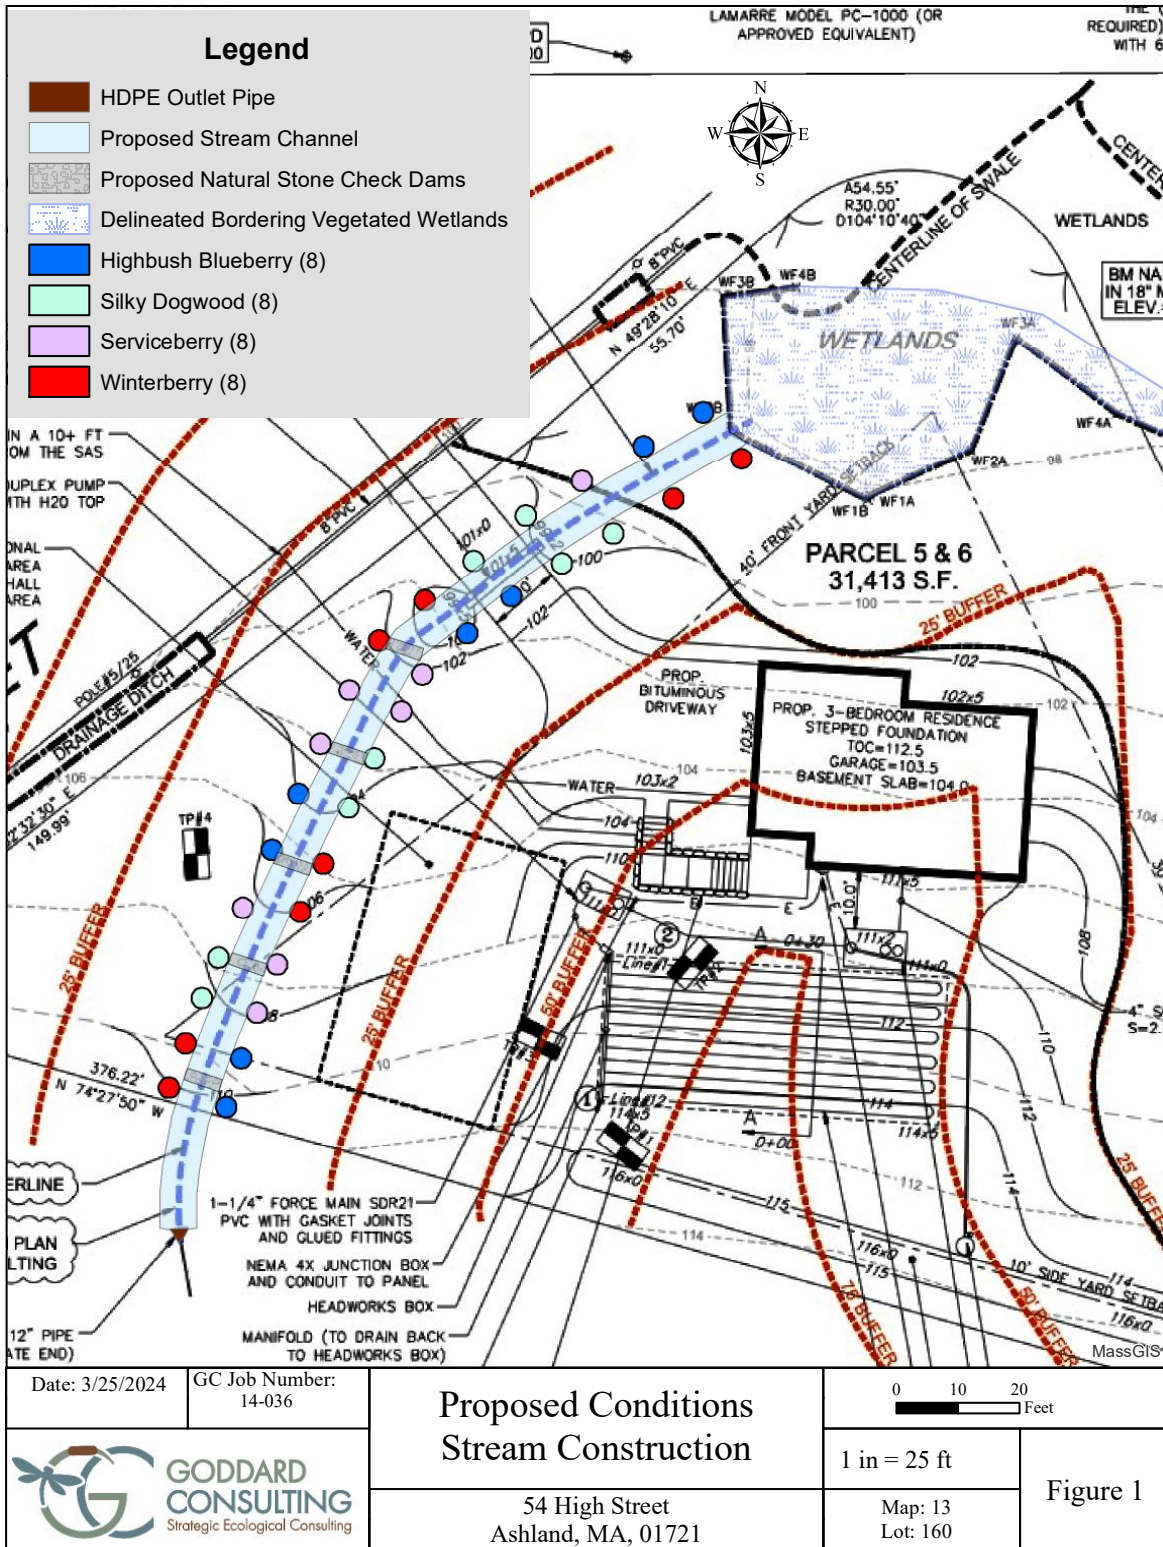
Stream Construction, Sizing, and Associated Plantings
